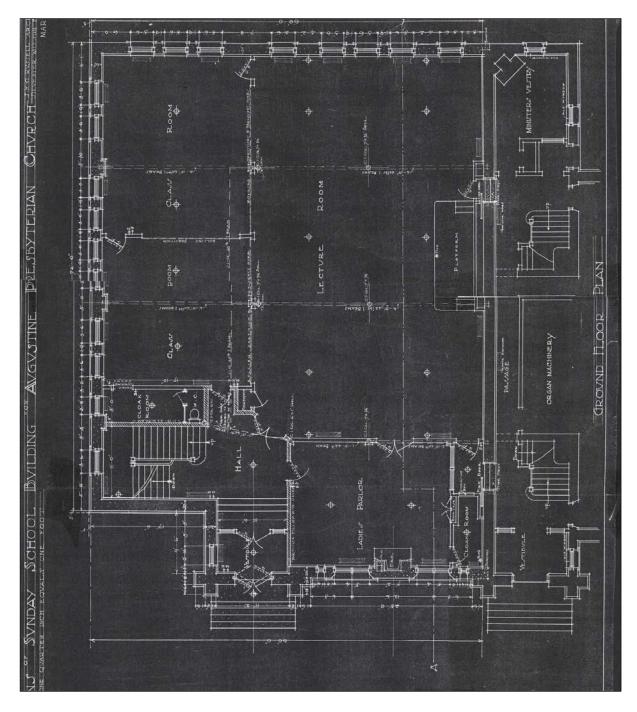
Augustine Presbyterian Church, 444 River Avenue, Architect's Plans for the Sunday School Building, "Ground Floor Plan," 1909. (Courtesy of City Archives.)
